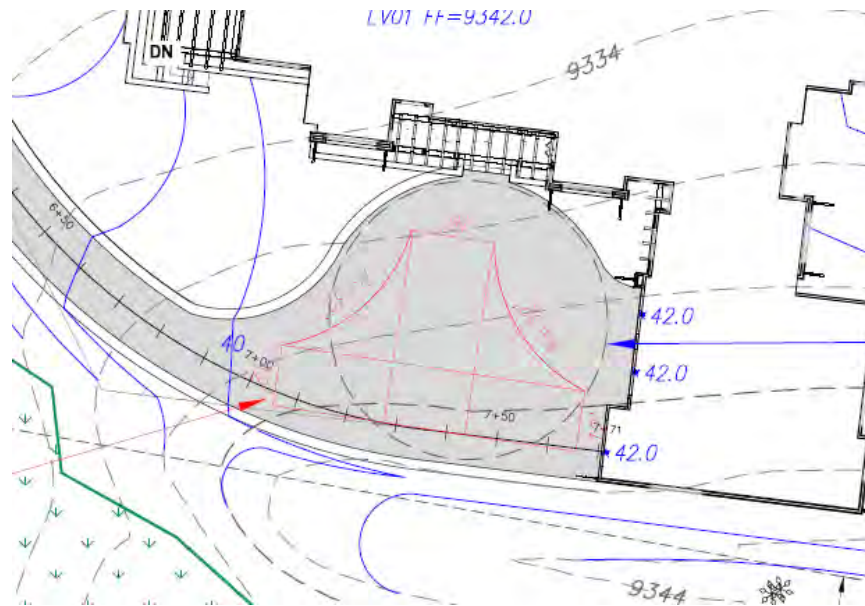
Driveway Plan – TFPD Standard Hammerhead Turn-Around
